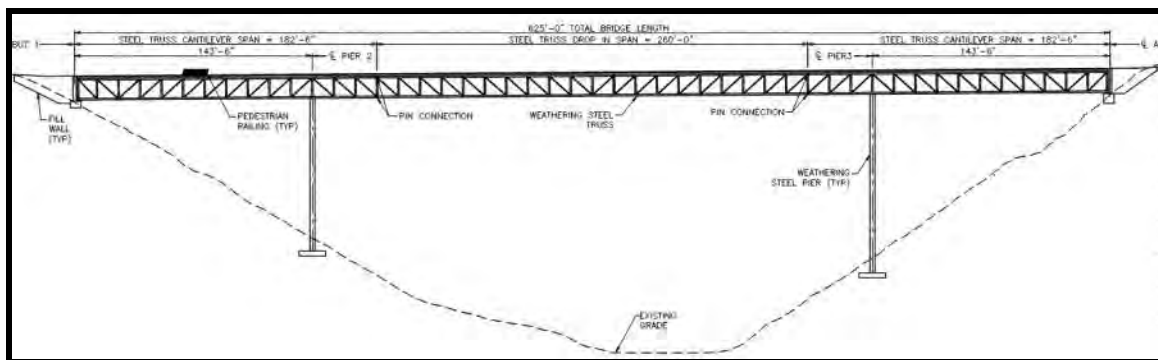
Proposed Elevation of AABC Bridge (Prefabricated Steel Truss)
